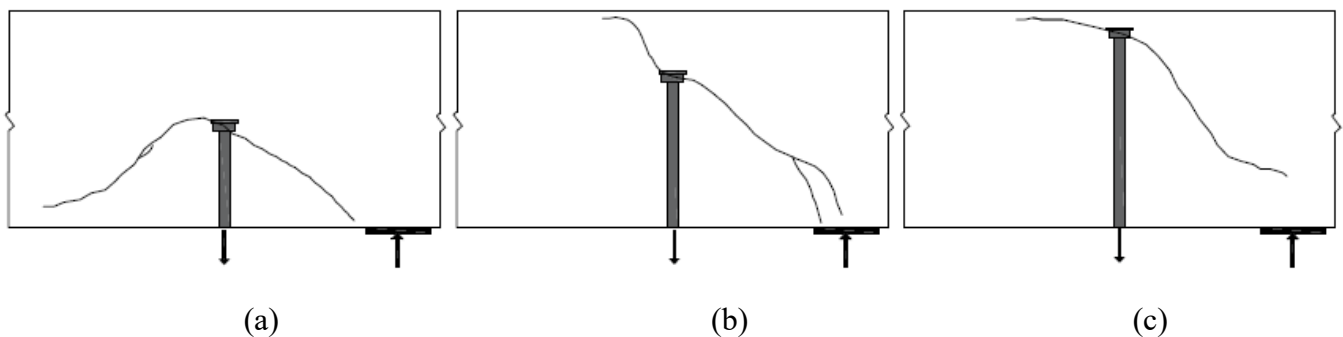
Failure Modes: (a) Concrete Breakout; (b) and (c) Joint Shear Failure (figure after Chun et al. 2009)
